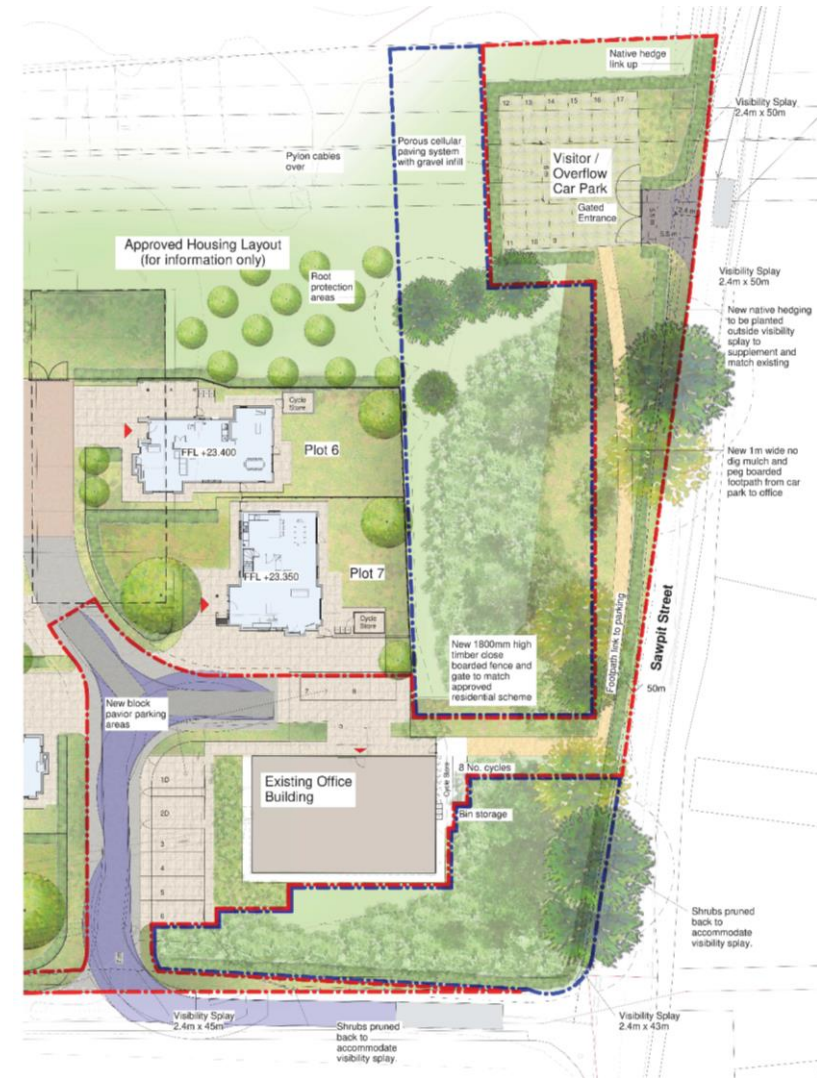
Proposed parking arrangements and footpath link to retained office building (dg 1000 RevB).
